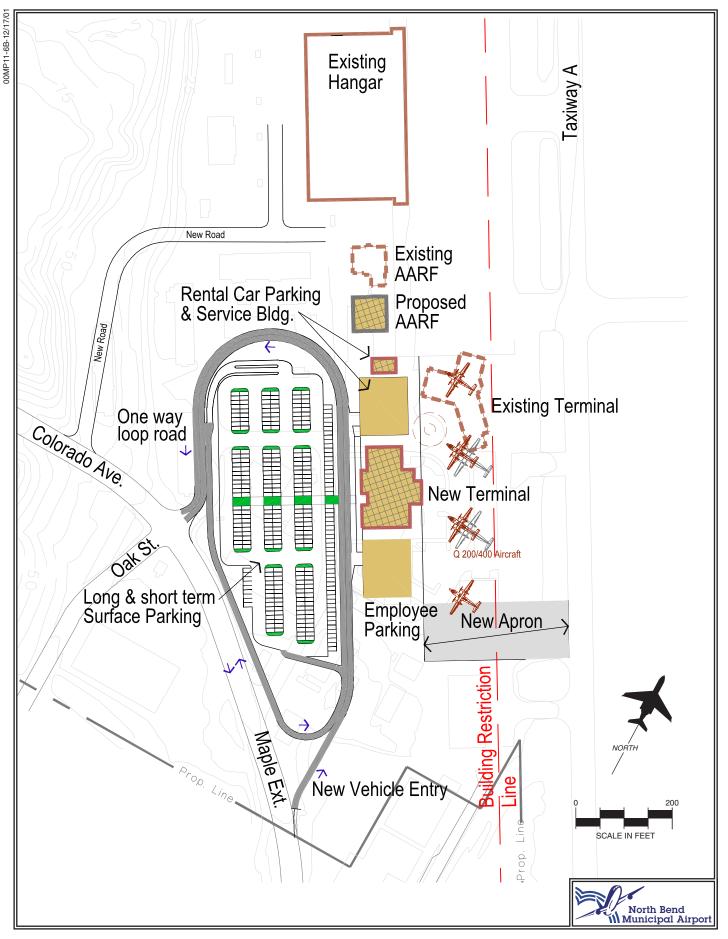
B TERMINAL AREA ALTERNATIVE 1 AT THE EXISTING TERMINAL
